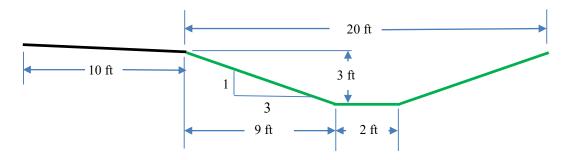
Cross-section schematic of 10 foot wide travel lane with drainage swale.
